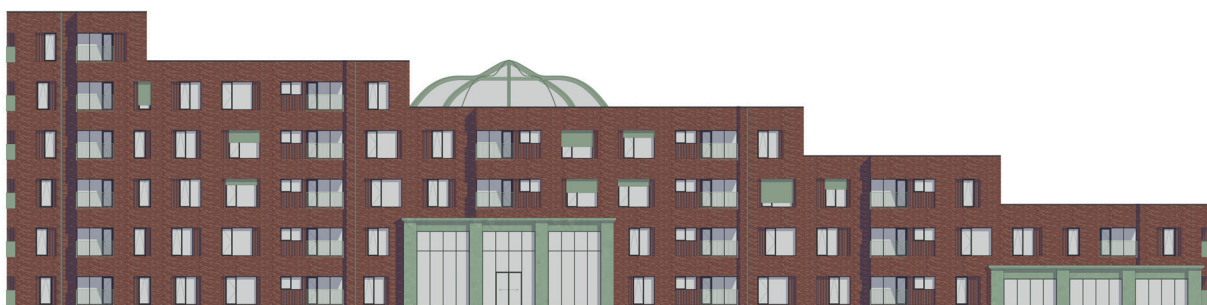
Elevation Outside East Facade (NTS: adapted from 1:100 original)
